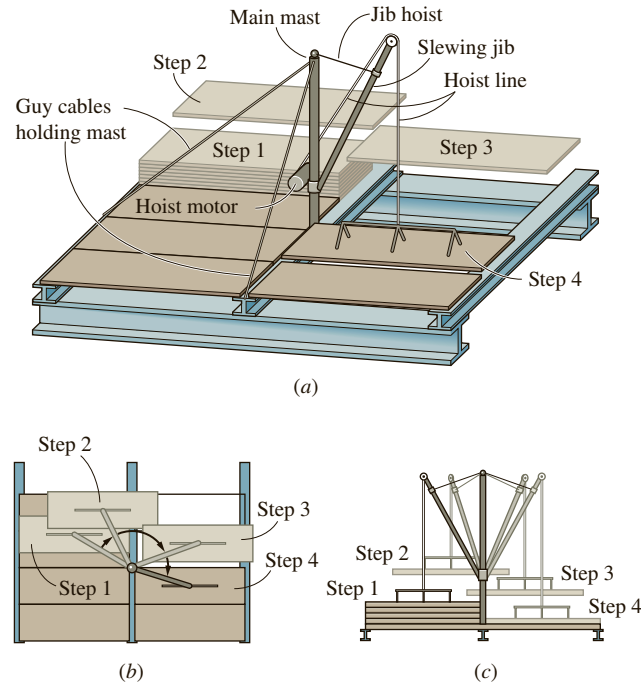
Placing roof panels with a derrick crane: (a) layout of placing panels with derrick onto coliseum roof structure; (b) sequence of picking and placing one panel (top view); (c) sequence of picking and placing one panel (side view).
